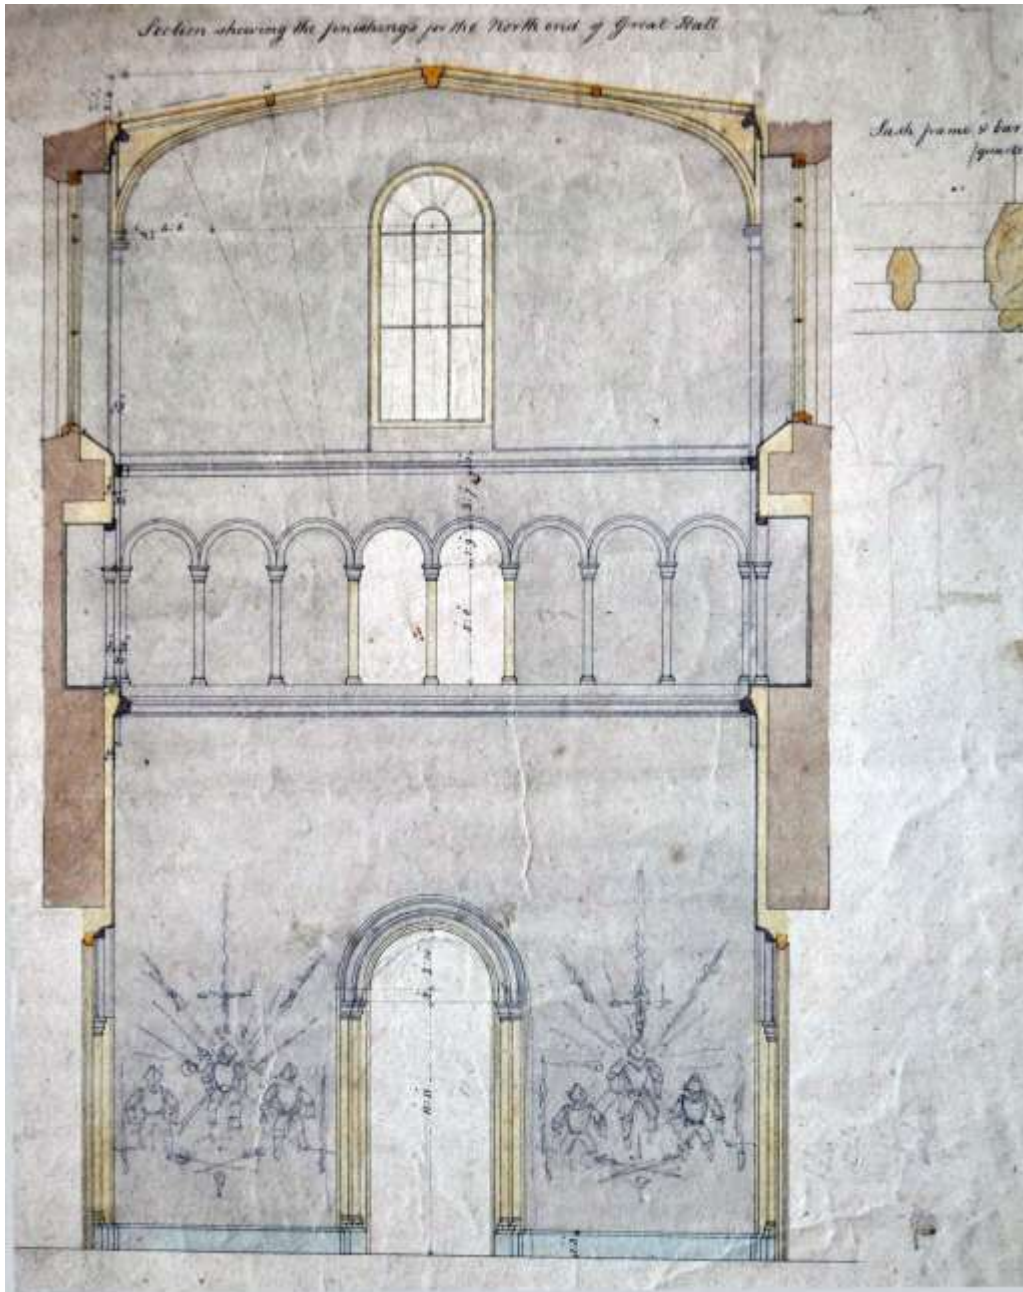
Part of Plan 173 – ‘Section showing the Finishings for the North end of the Great Hall’ – dated 7 February 1818 (Eastnor Castle)
